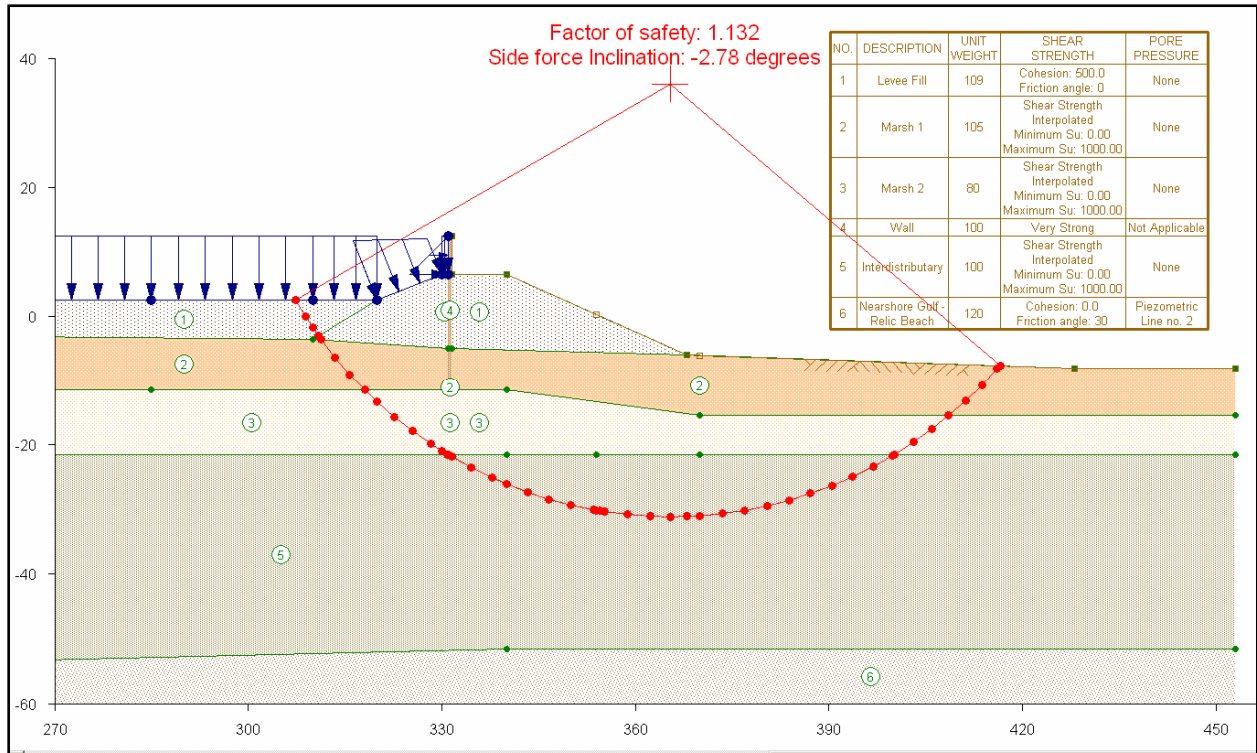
IHNC – East Bank (North Breach), Case 5a, Canal Water Level = Top of Wall = 12.5 ft (NAVD 88), without Crack
